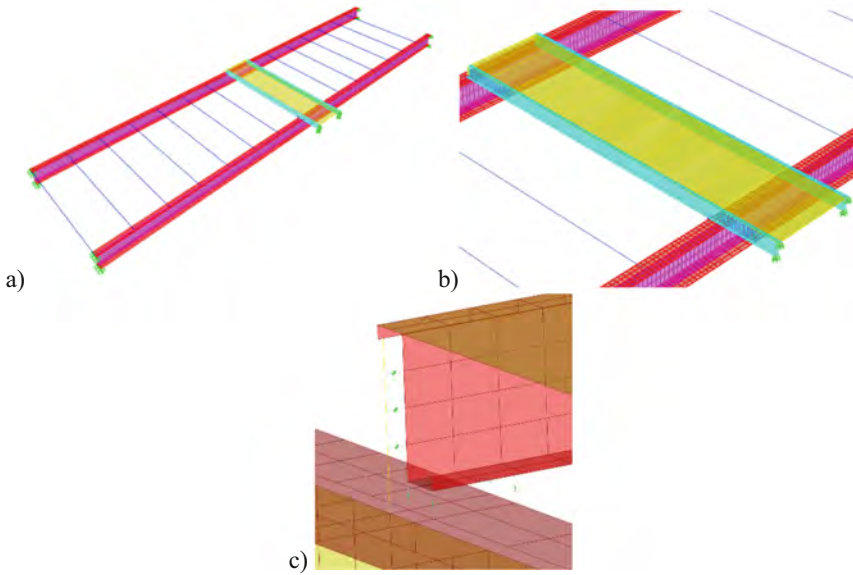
Numerical model: a) global view of the model; b) detailed view with the wall mesh and end fastenings; c) purlin end connections and boundary elements.
